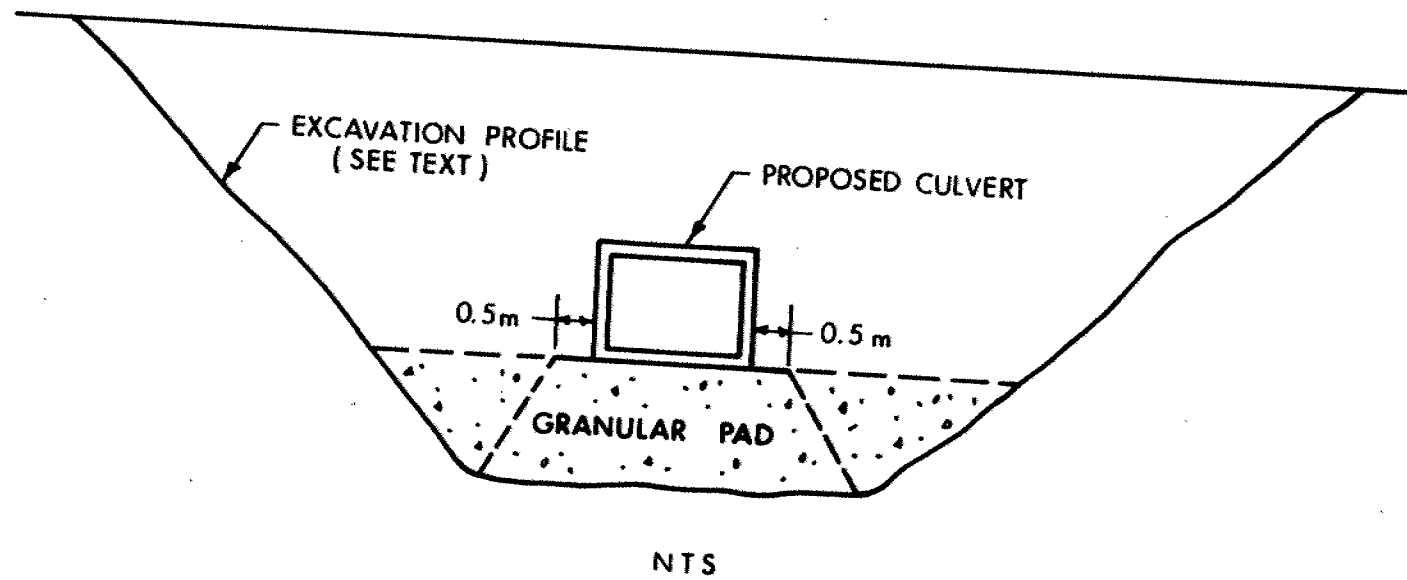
CROSS-SECTION SHOWING SUBEXCAVATION
